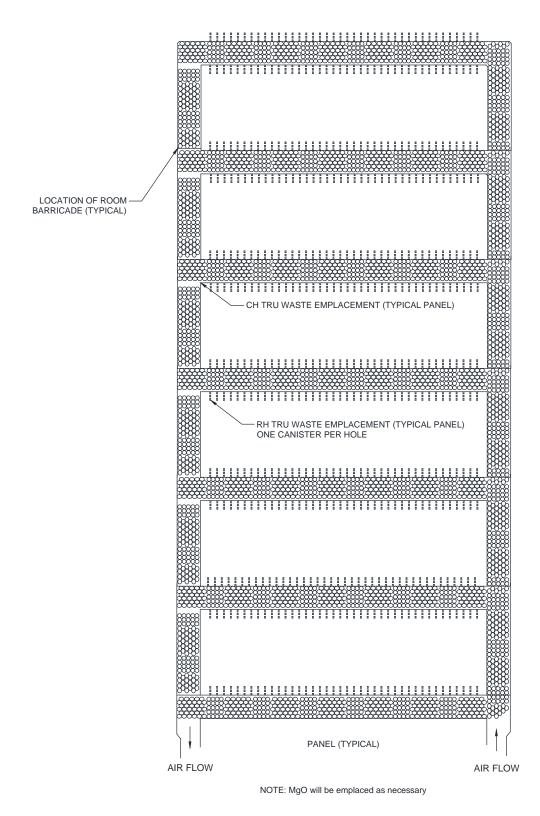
Typical RH and CH TRU Mixed Waste Container Disposal Configuration
